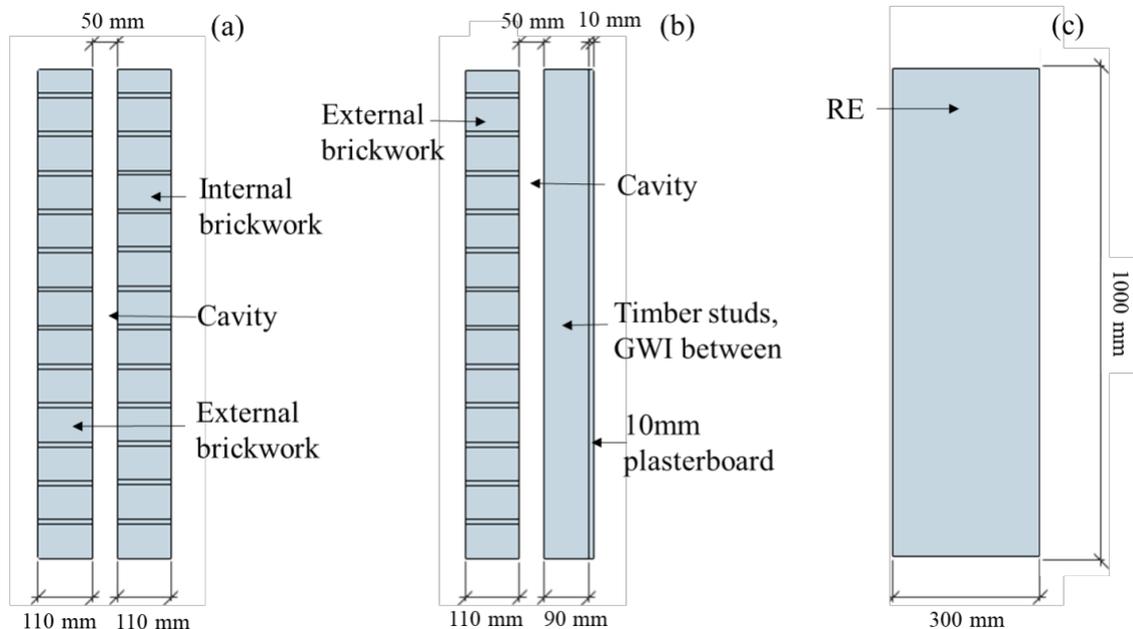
Cross-section of building envelope construction types; (a) cavity brick, (b) brick veneer, (c) rammed earth.
